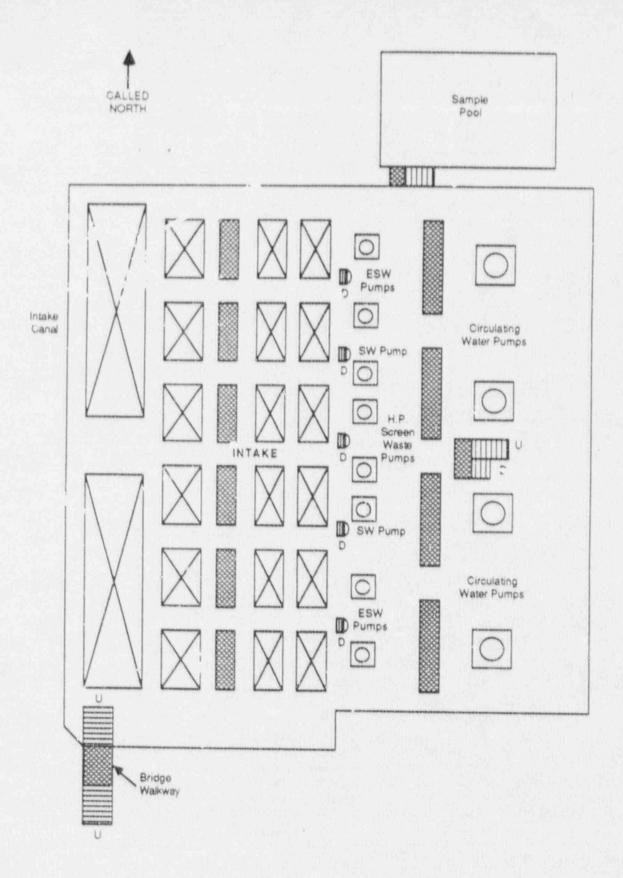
Oyster Creek Intake Structure, Elevation 6'0"
